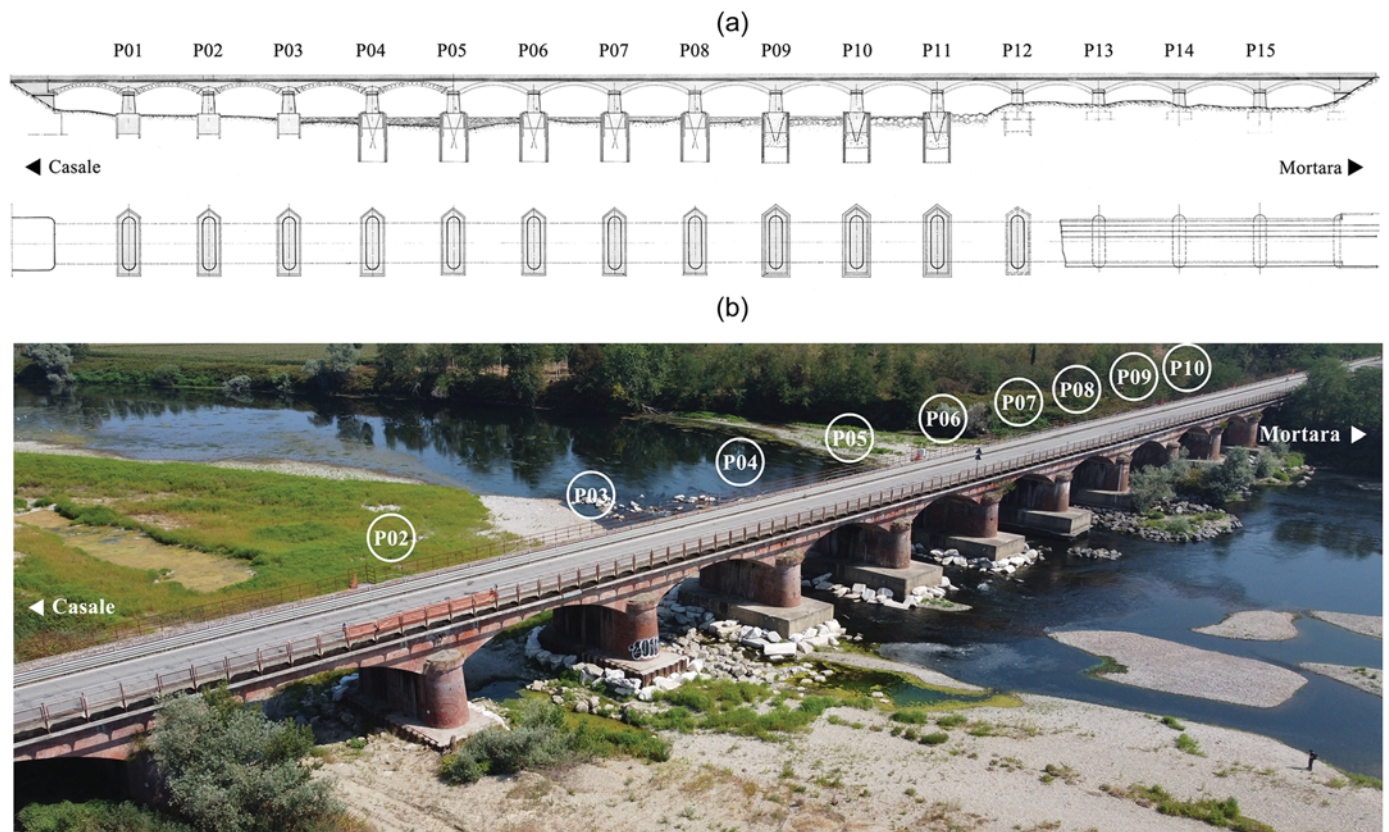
The Candia Bridge: (a) Plan and elevation from downstream; (b) Aerial view from downstream.
